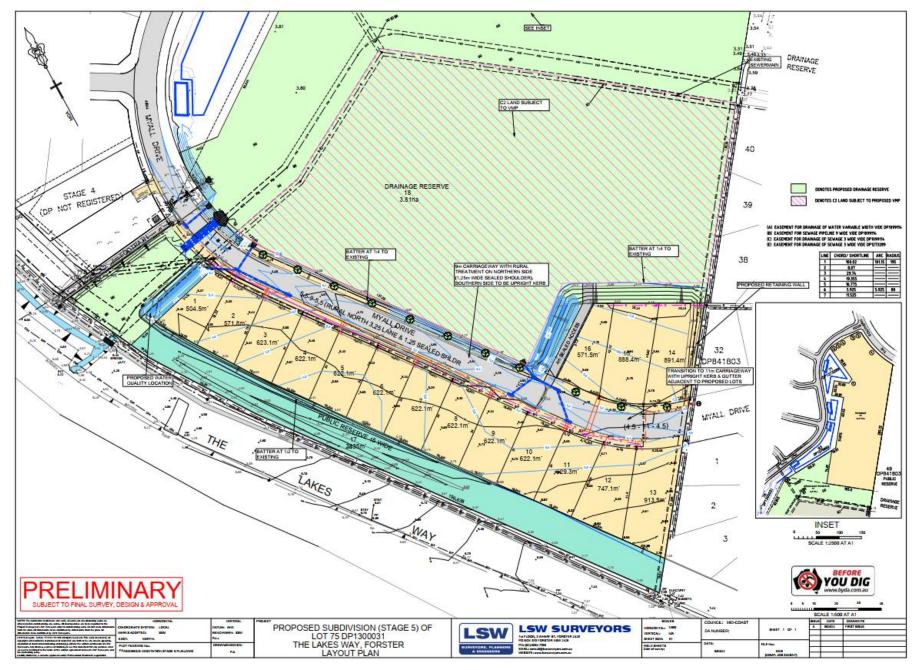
Plan of proposed subdivision (Source: LSW Surveyors, 2024)
